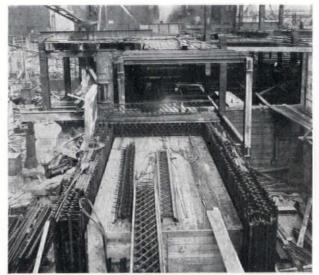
Vault Under Construction, Showing Vertical Reinforcing
